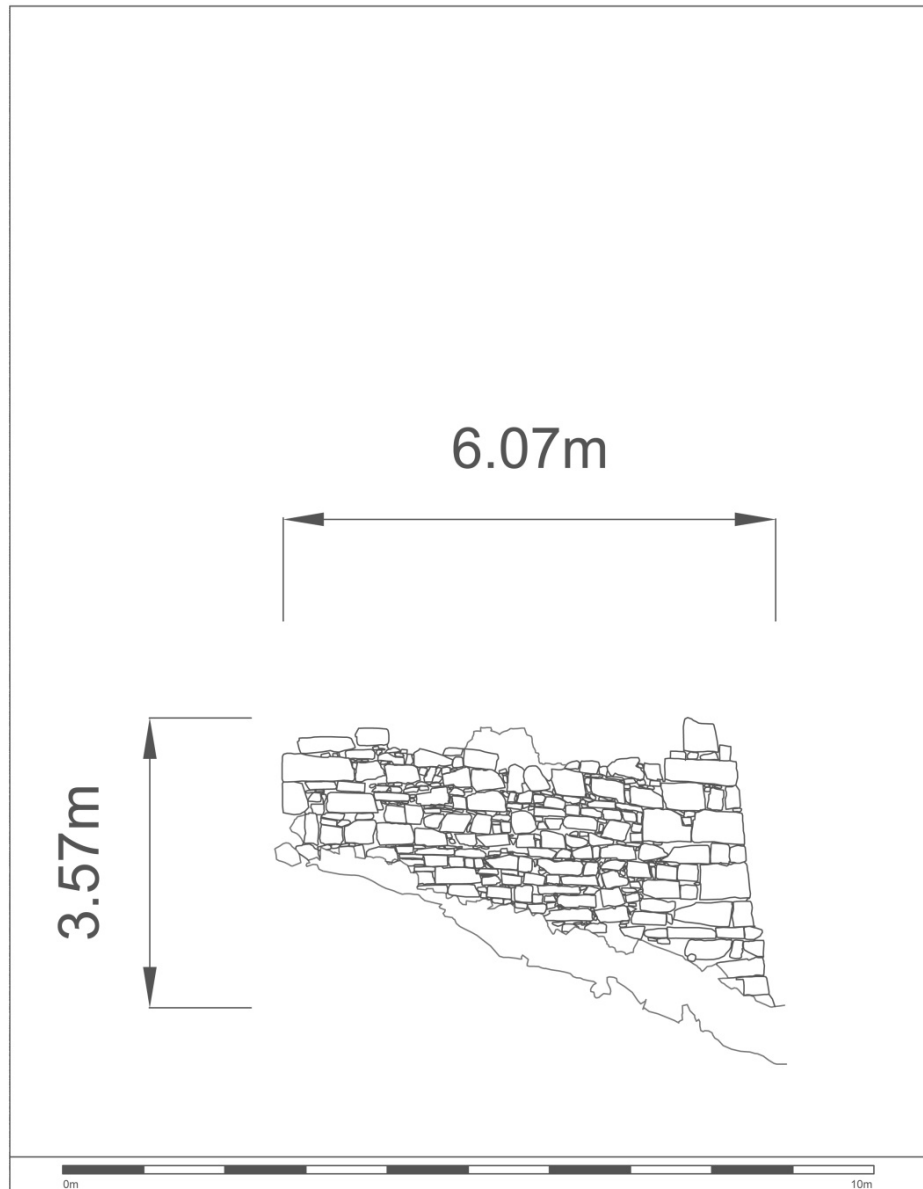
External elevation of the east wall of the collapsed signal tower at Cleggan Hill Signal Station.
